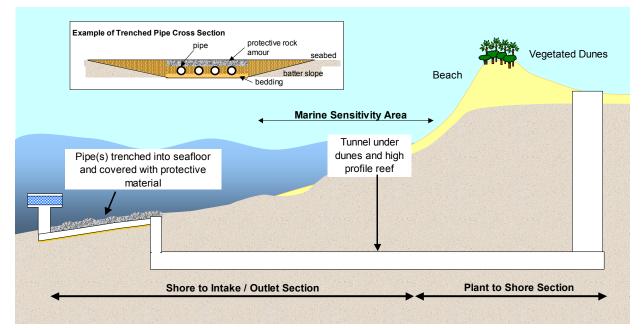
Tunnels and pipe Option - Pipe trenched into seafloor
